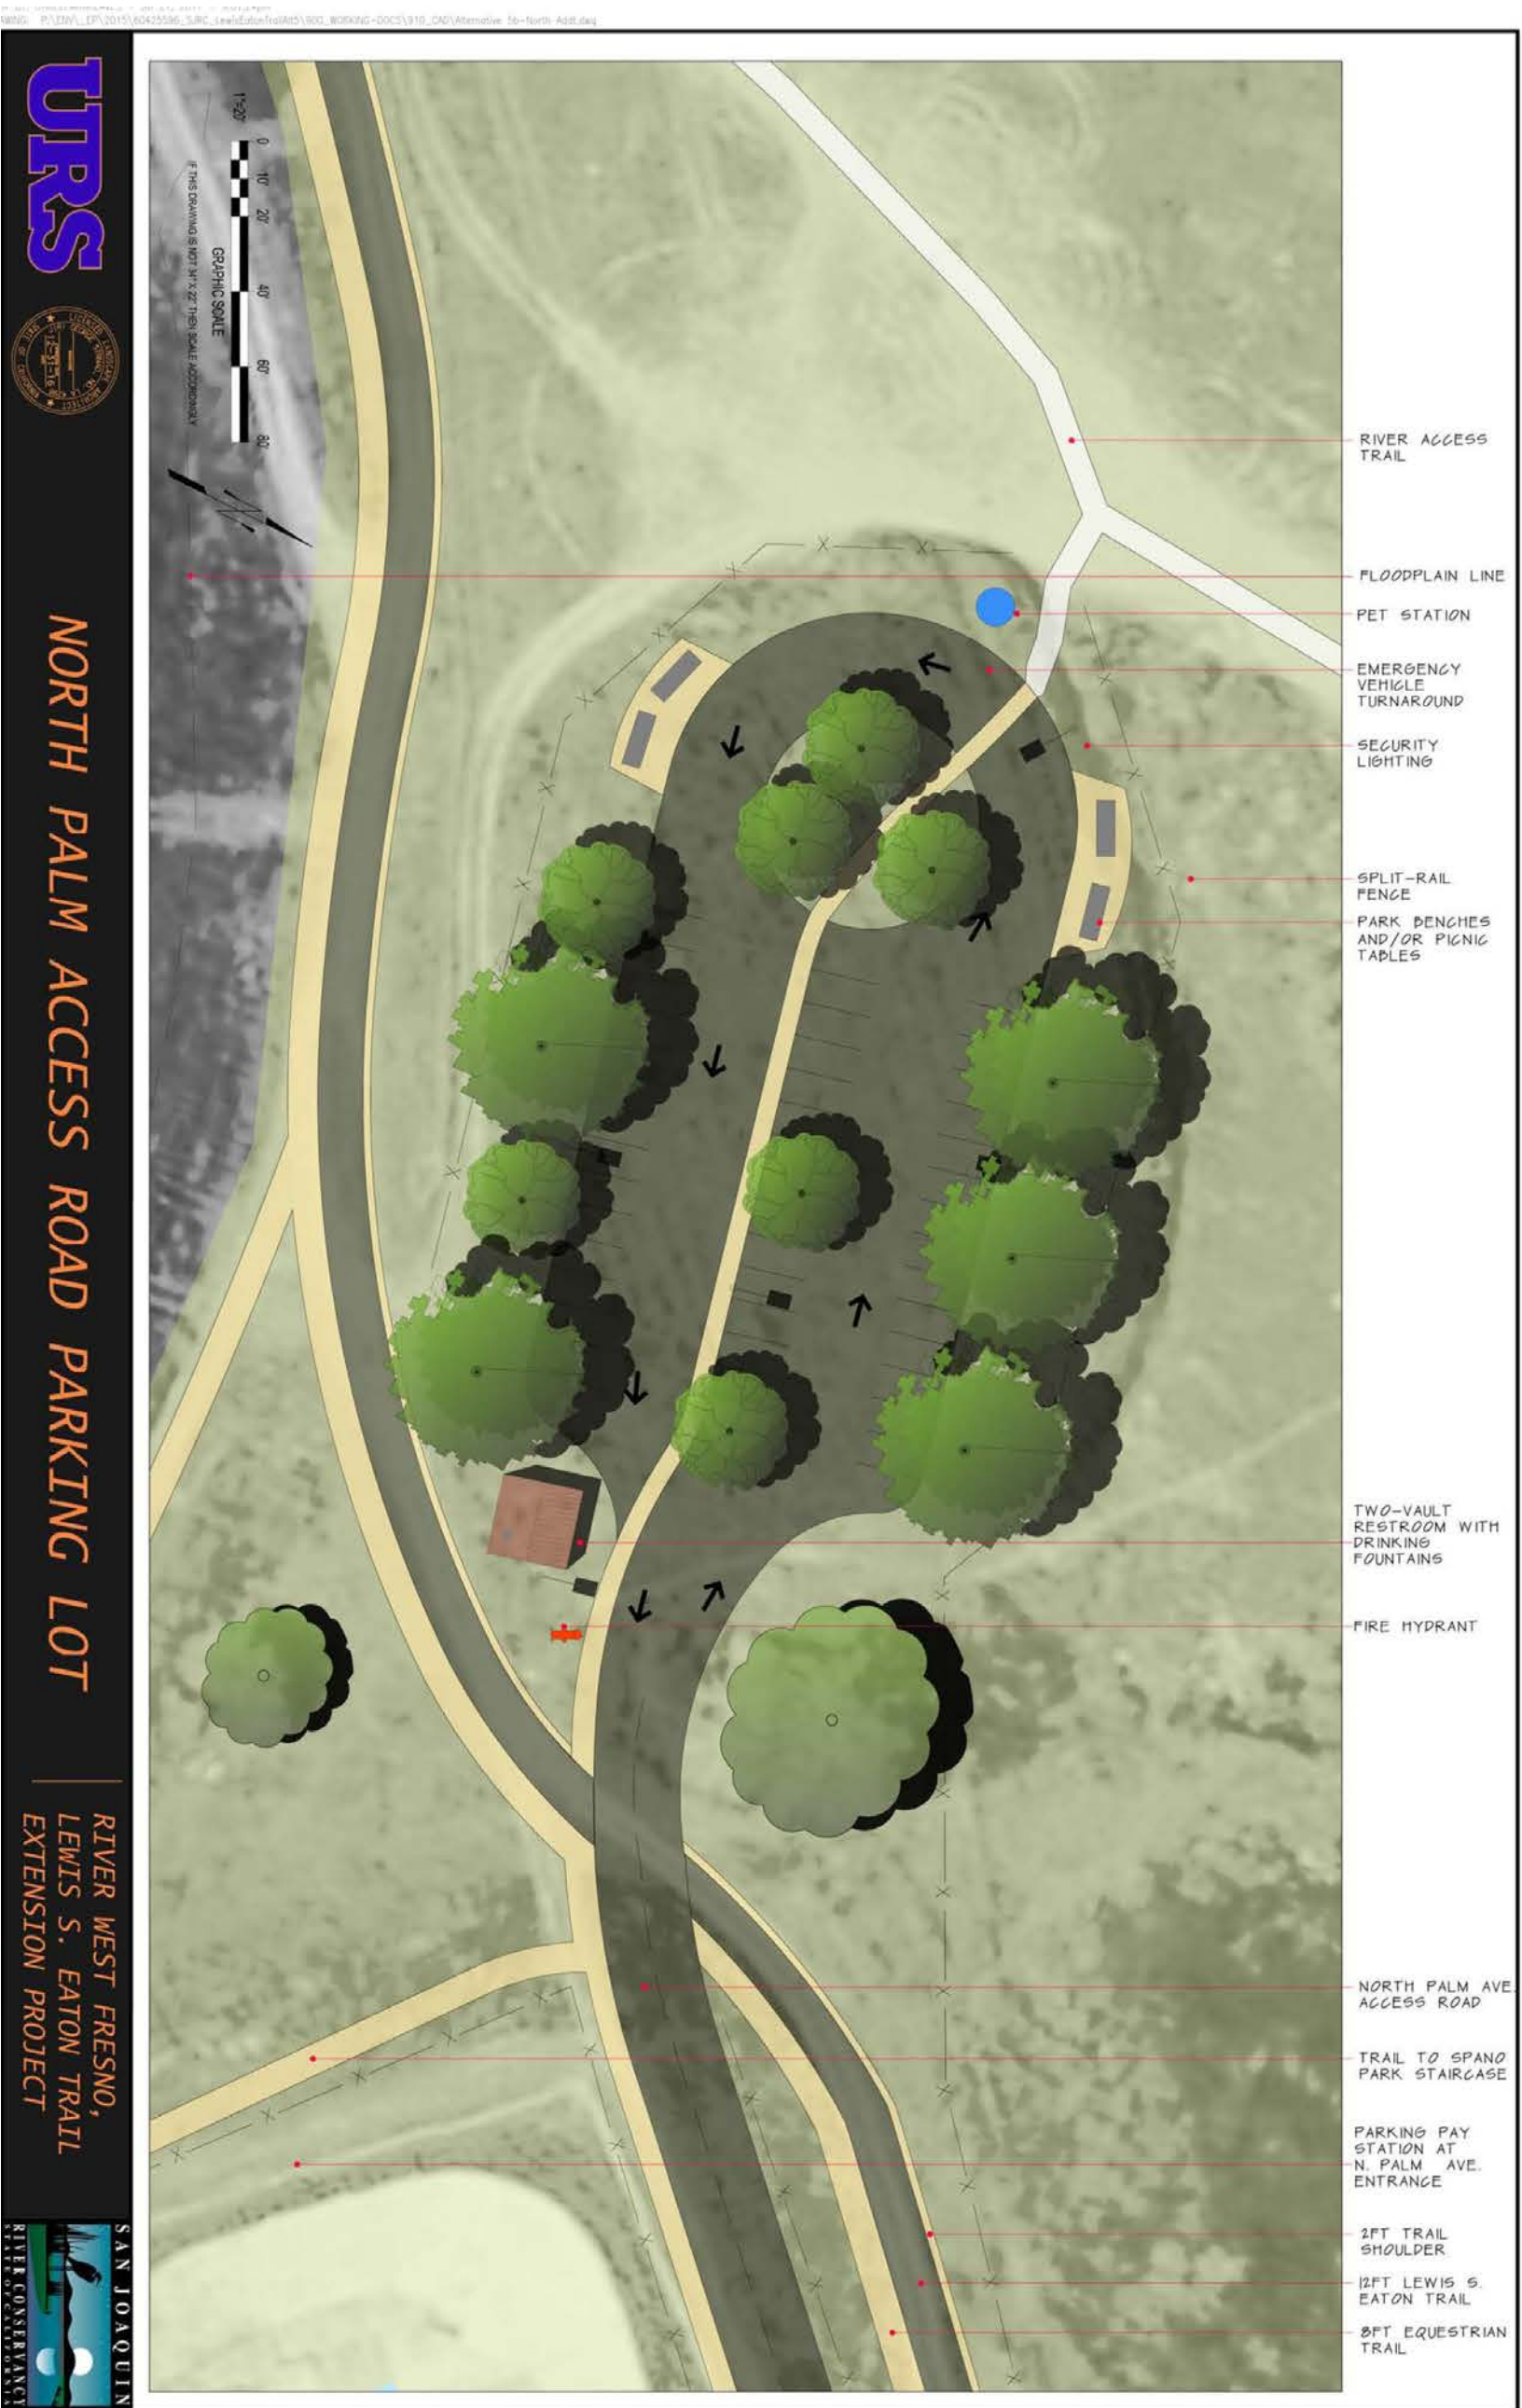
Planned Access Point and Parking at Palm and Nees Avenue under Alternative 5B
